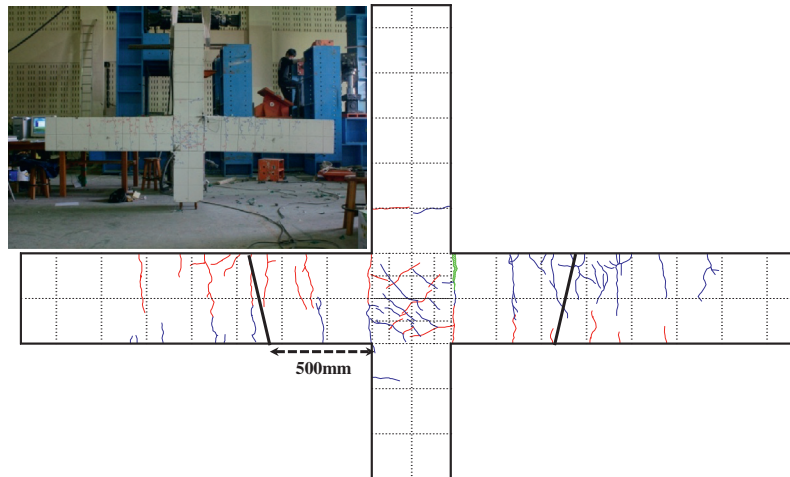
Crack Patterns at Failure of PC-IH-50 Specimen.
